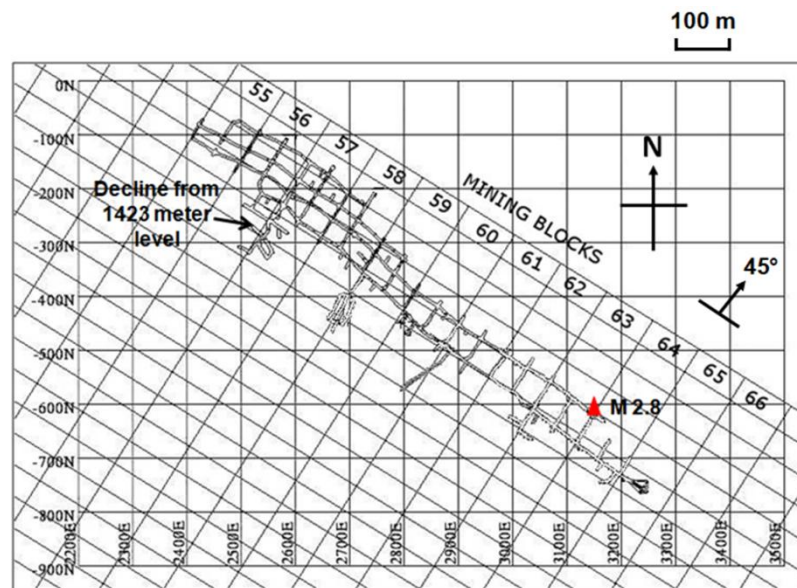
Typical underground mine layout at Mufulira mine (at 1440 mL, indicating M 2.8 rockburst).
